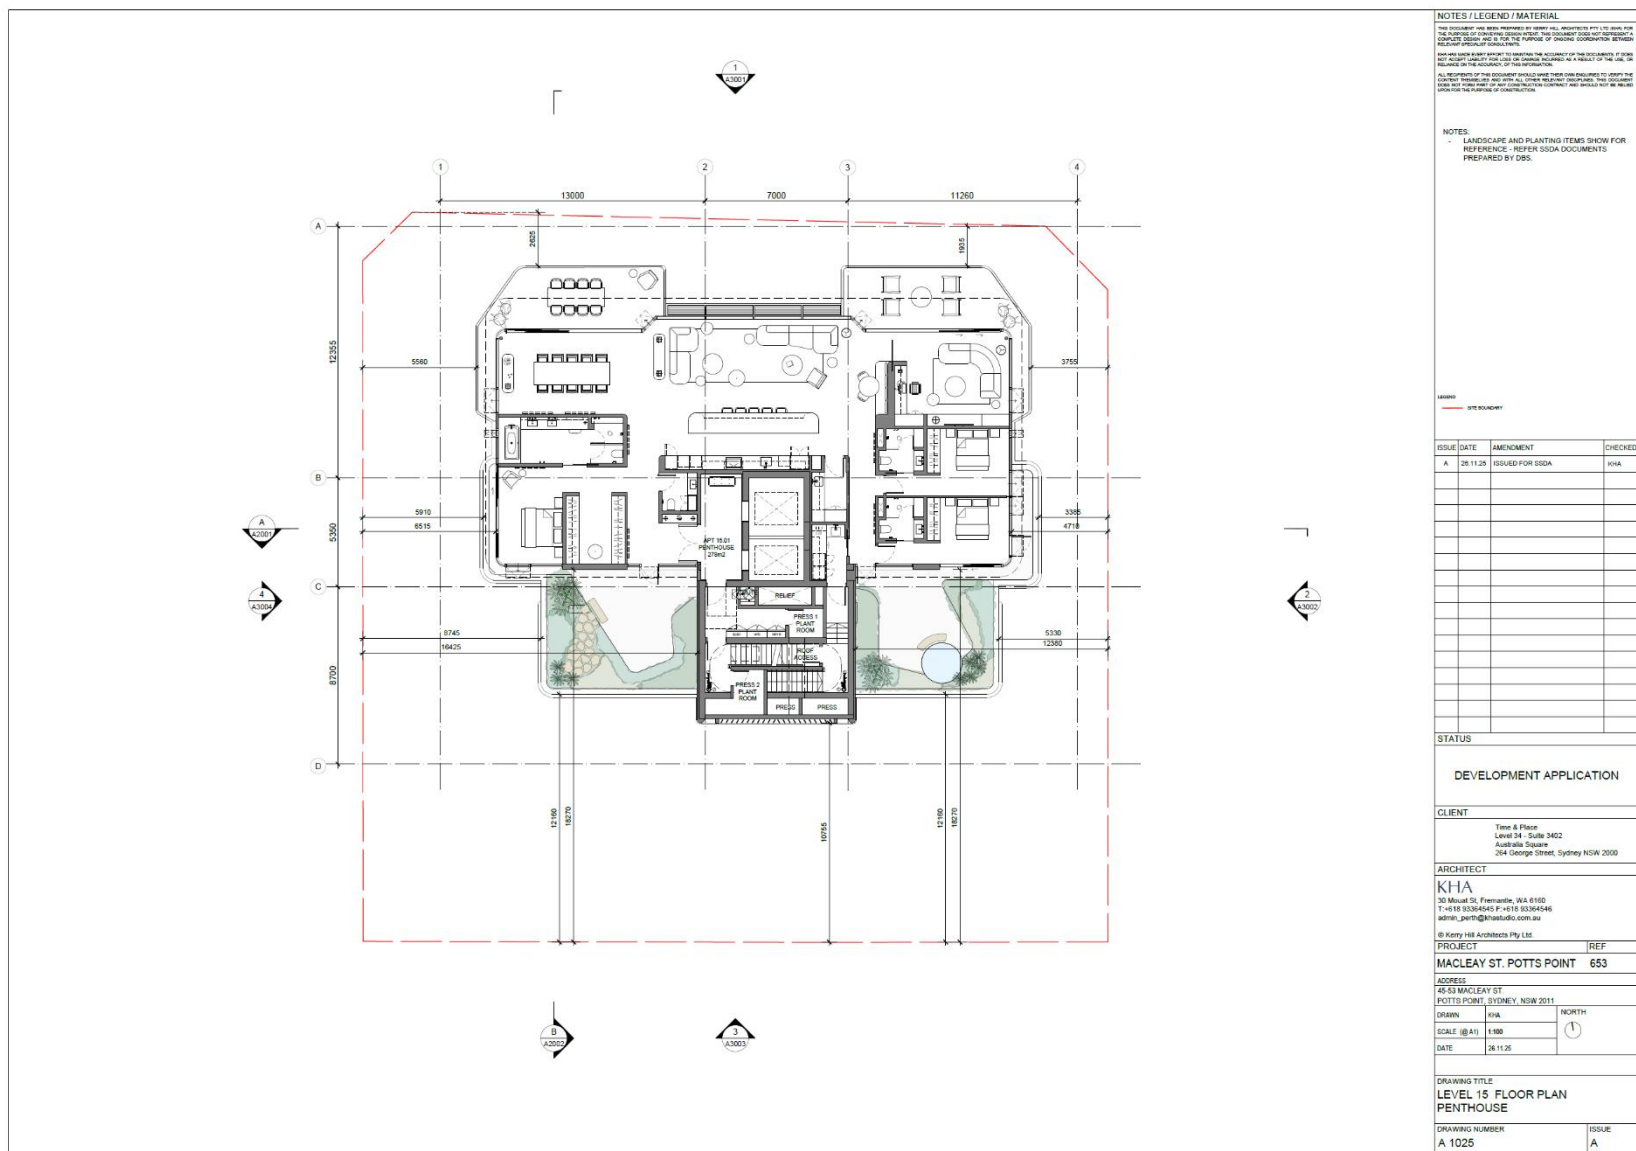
Level 15 floor plan (Kerry Hill Architects)
